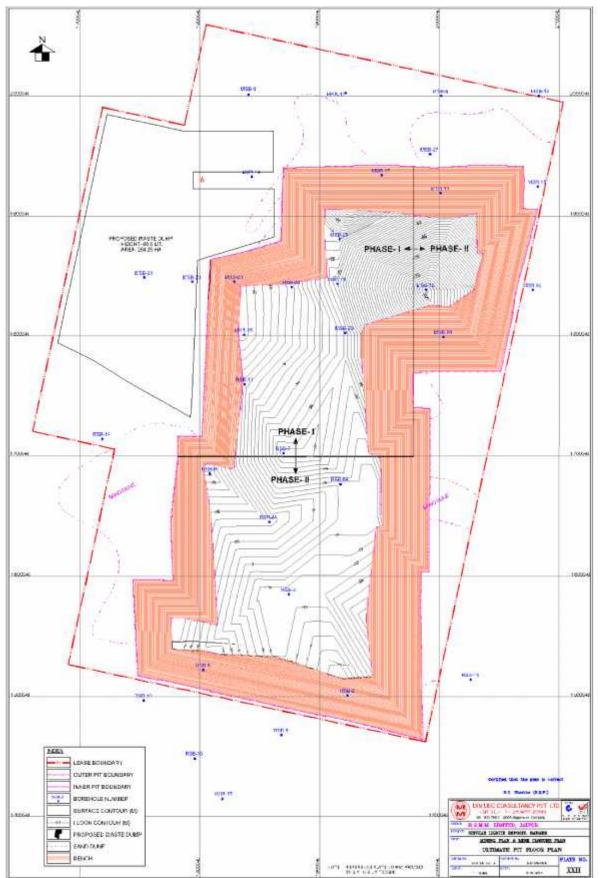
Ultimate Pit Floor Plan of Shivkar Lignite Block
